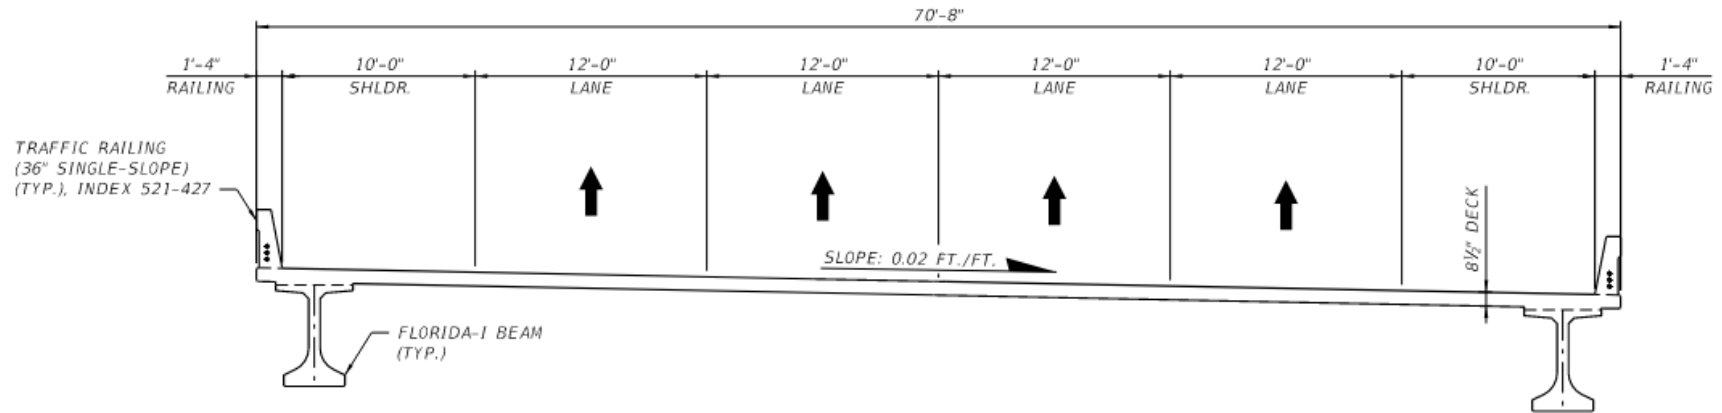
Proposed Northbound I-75 over Moccasin Wallow Road Bridge Typical Section
